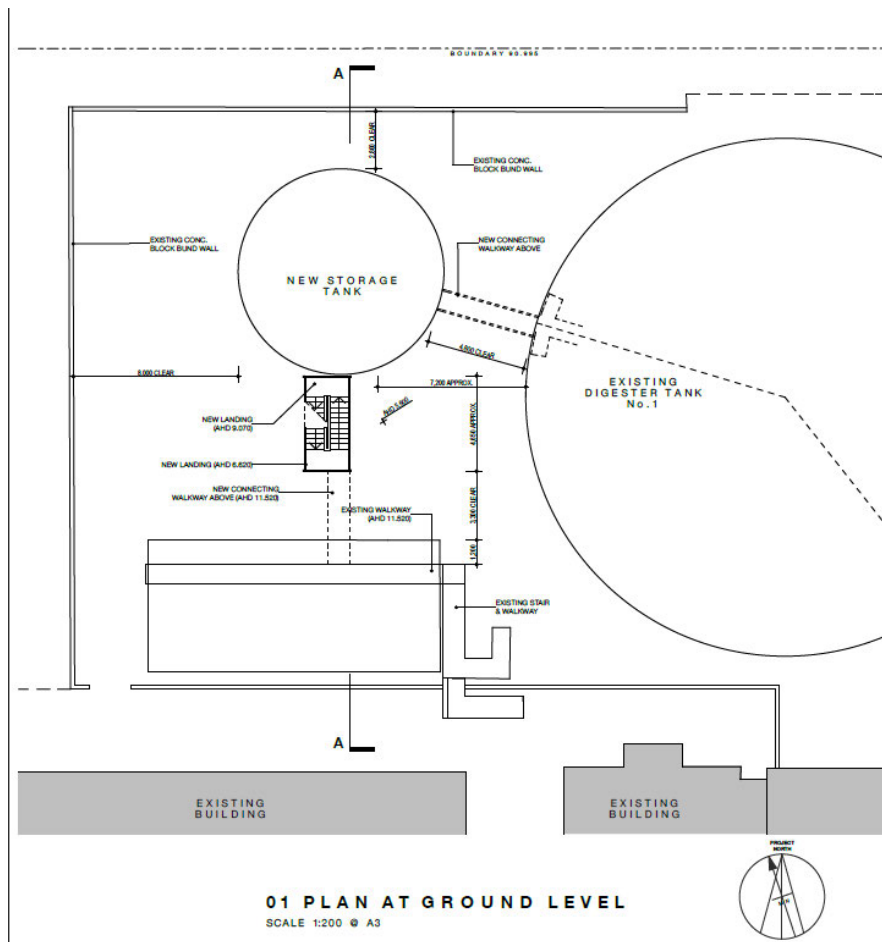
Floor plan of proposed storage tank (Source: James Gatley Architects)
